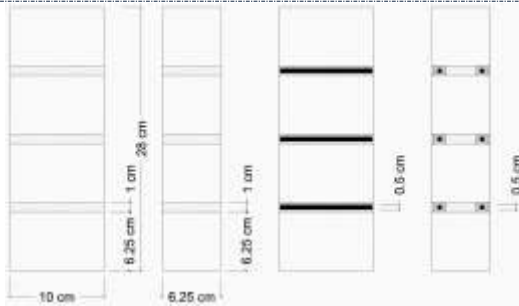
Geometrical characteristics of the masonry prisms and reinforcement layout.
